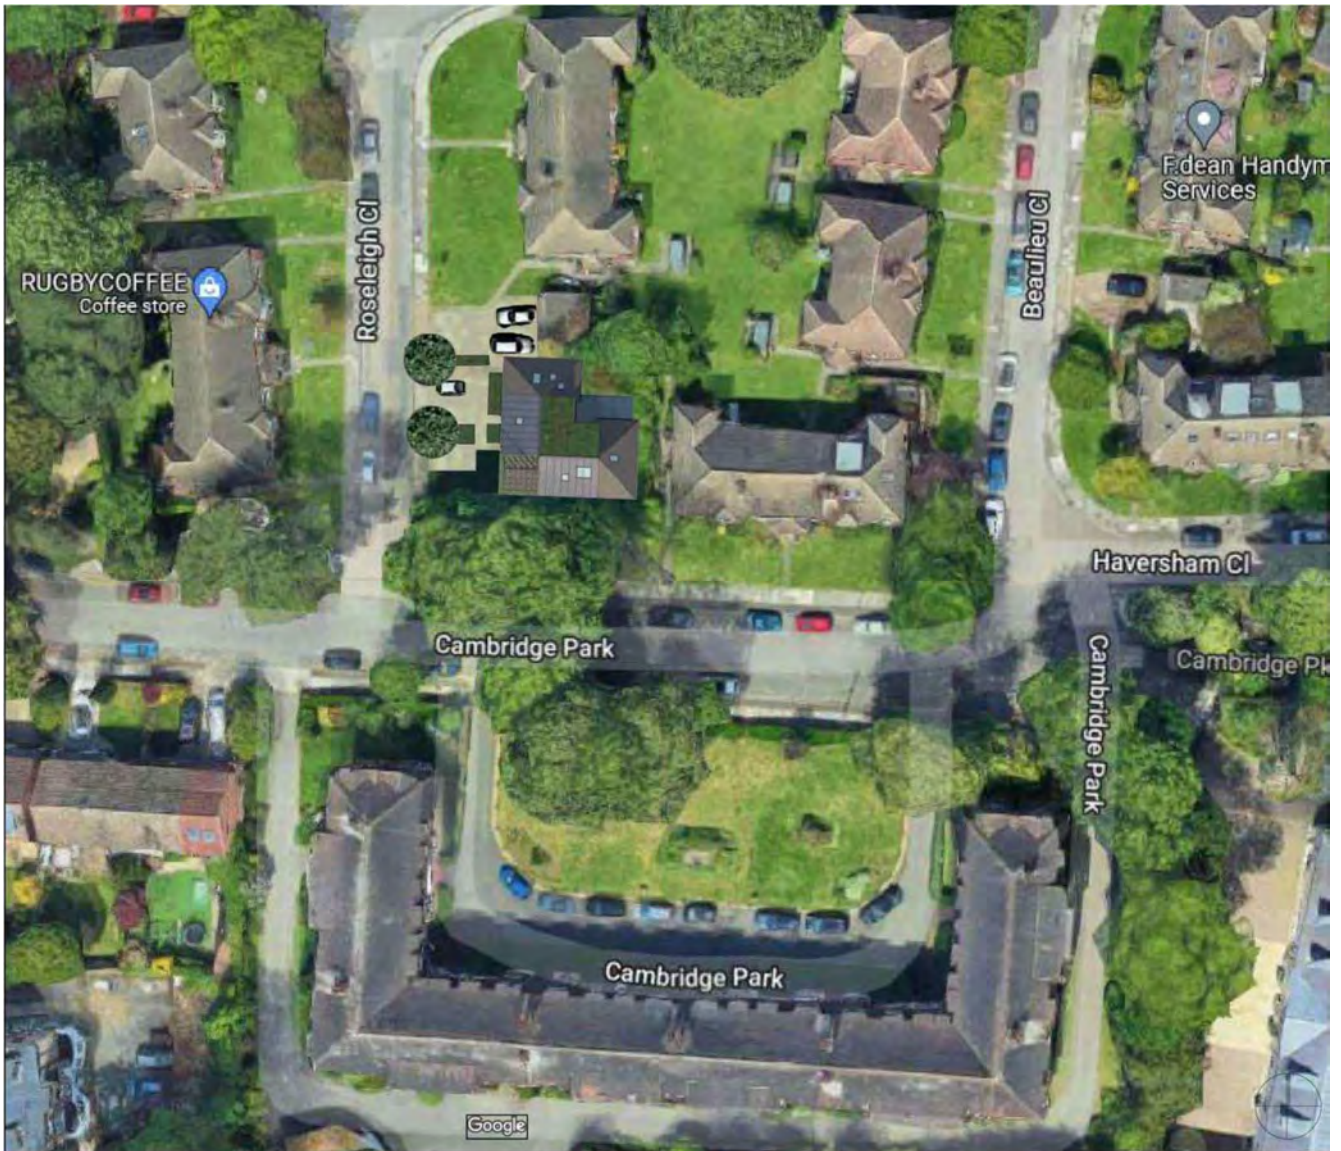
Roof plan view of the proposal within the existing context (Google Maps)
